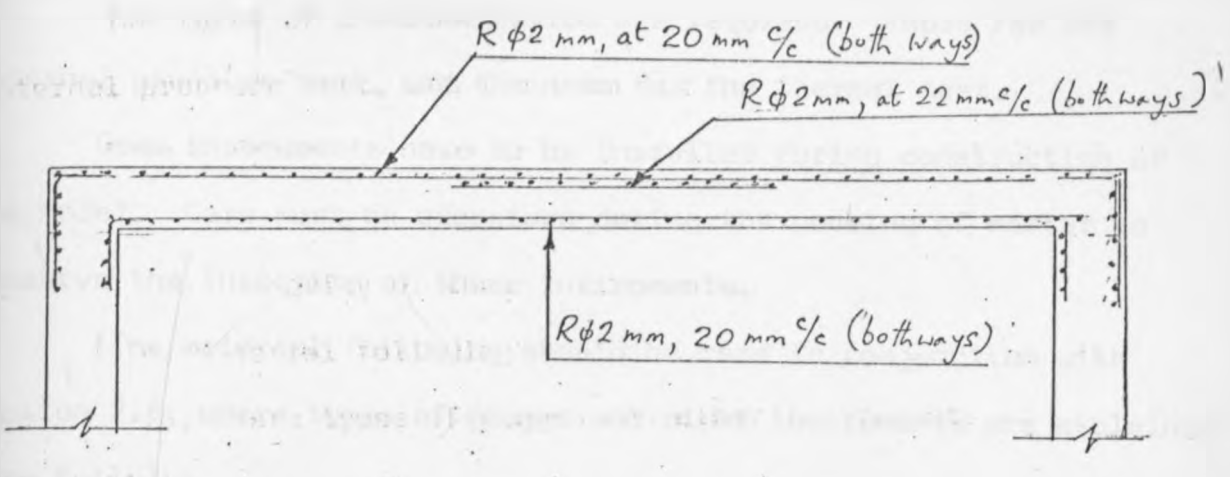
Layout of Reinforcement for Stage 6 (Final)
